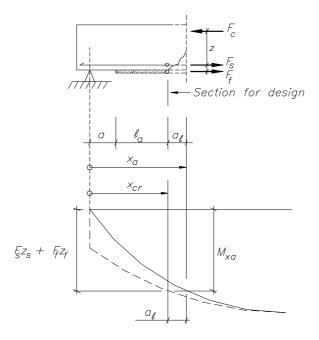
Anchorage of CFRP and shifted bending moment and the position of the last crack (Täljsten et al., 2011).
